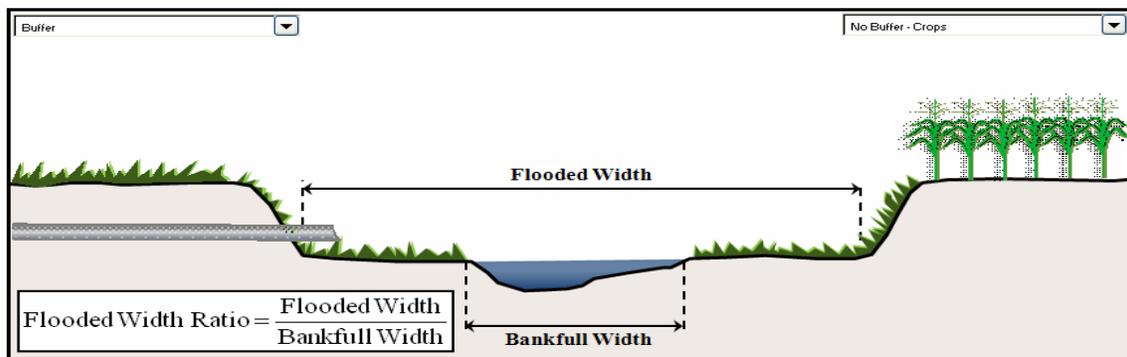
Two-stage ditch diagram showing bankfull conditions in the inset channel, benches with grass, a grass buffer on the left bank, a subsurface drainage outlet, and a field planted in corn on the right bank. Target flooded width ratios are usually 4 to 5.
